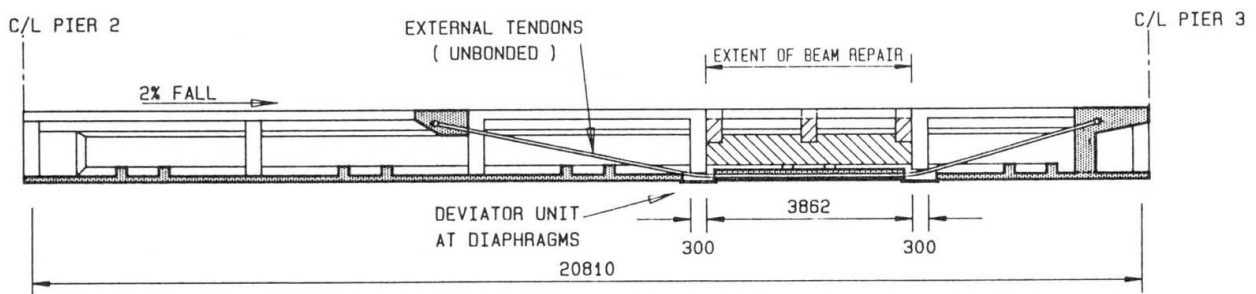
Typical elevation of beam reconstruction (Seventh Ave)
